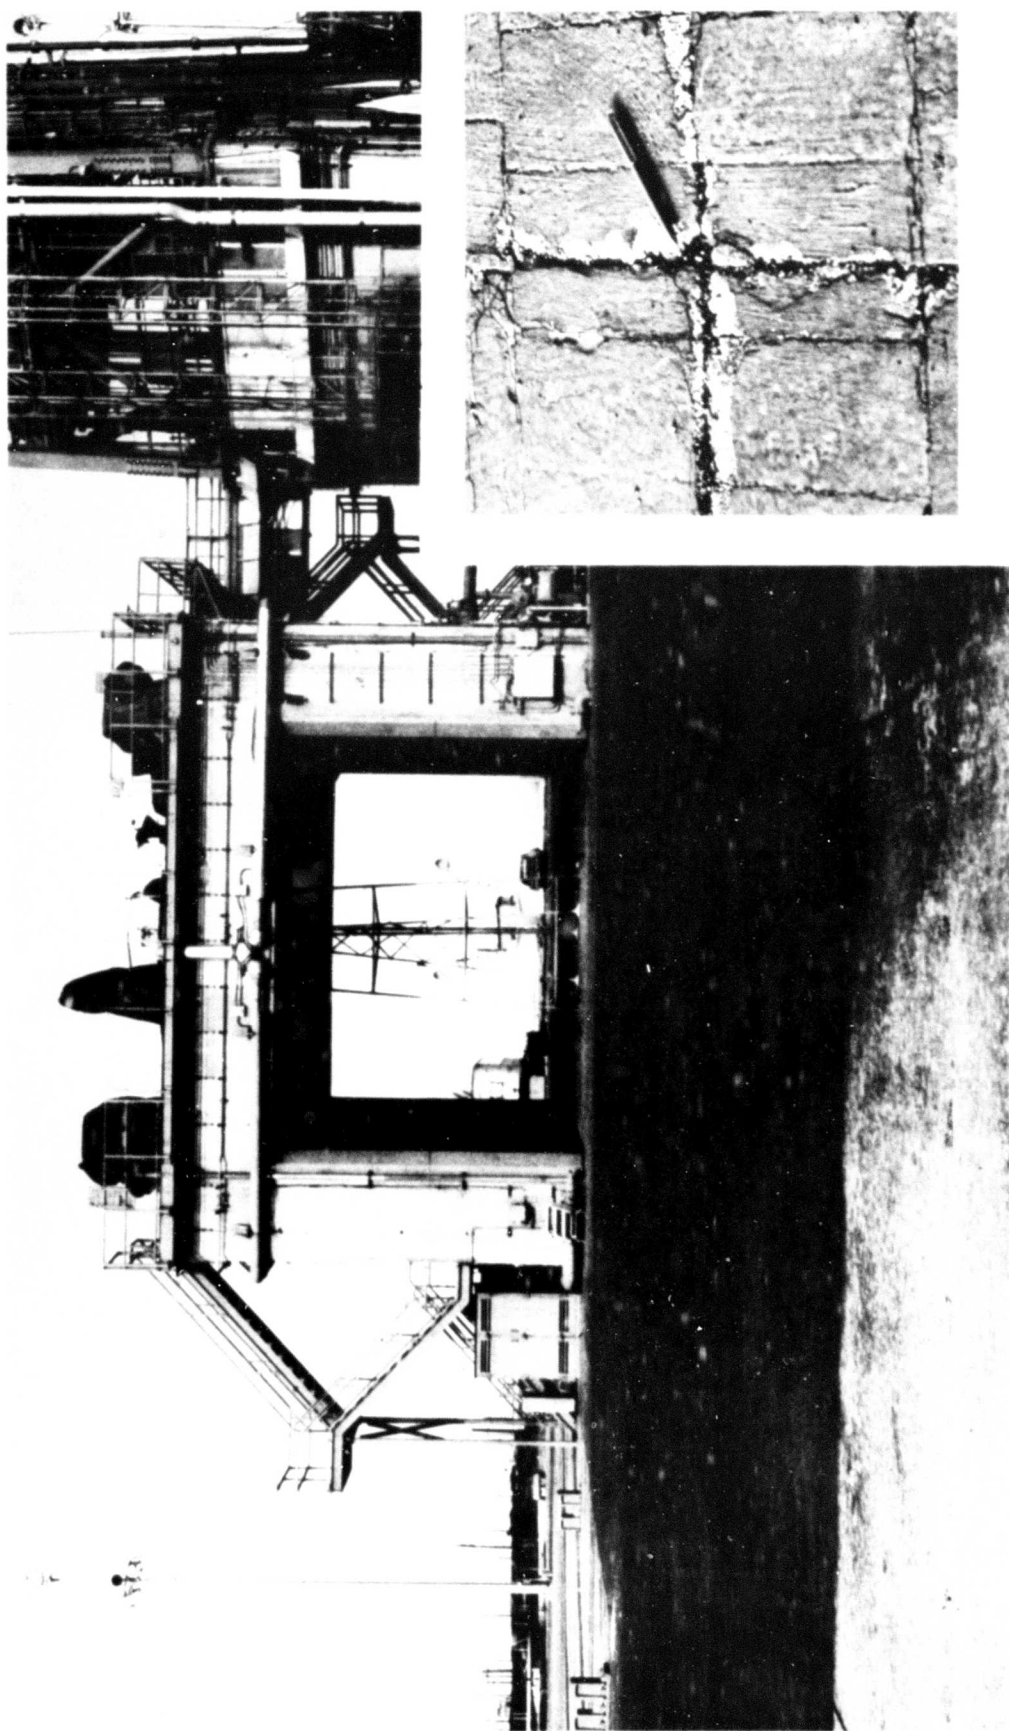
Launch Complex 34 KSC. Grey Area is Super Duty Fireclay Brick Pad Bonded to Base with Epoxy Adhesive. Surface Smoothed with Calcium Aluminate Cement Grout. Insert Shows Brick Joint Damage Due to Vehicular Traffic.
